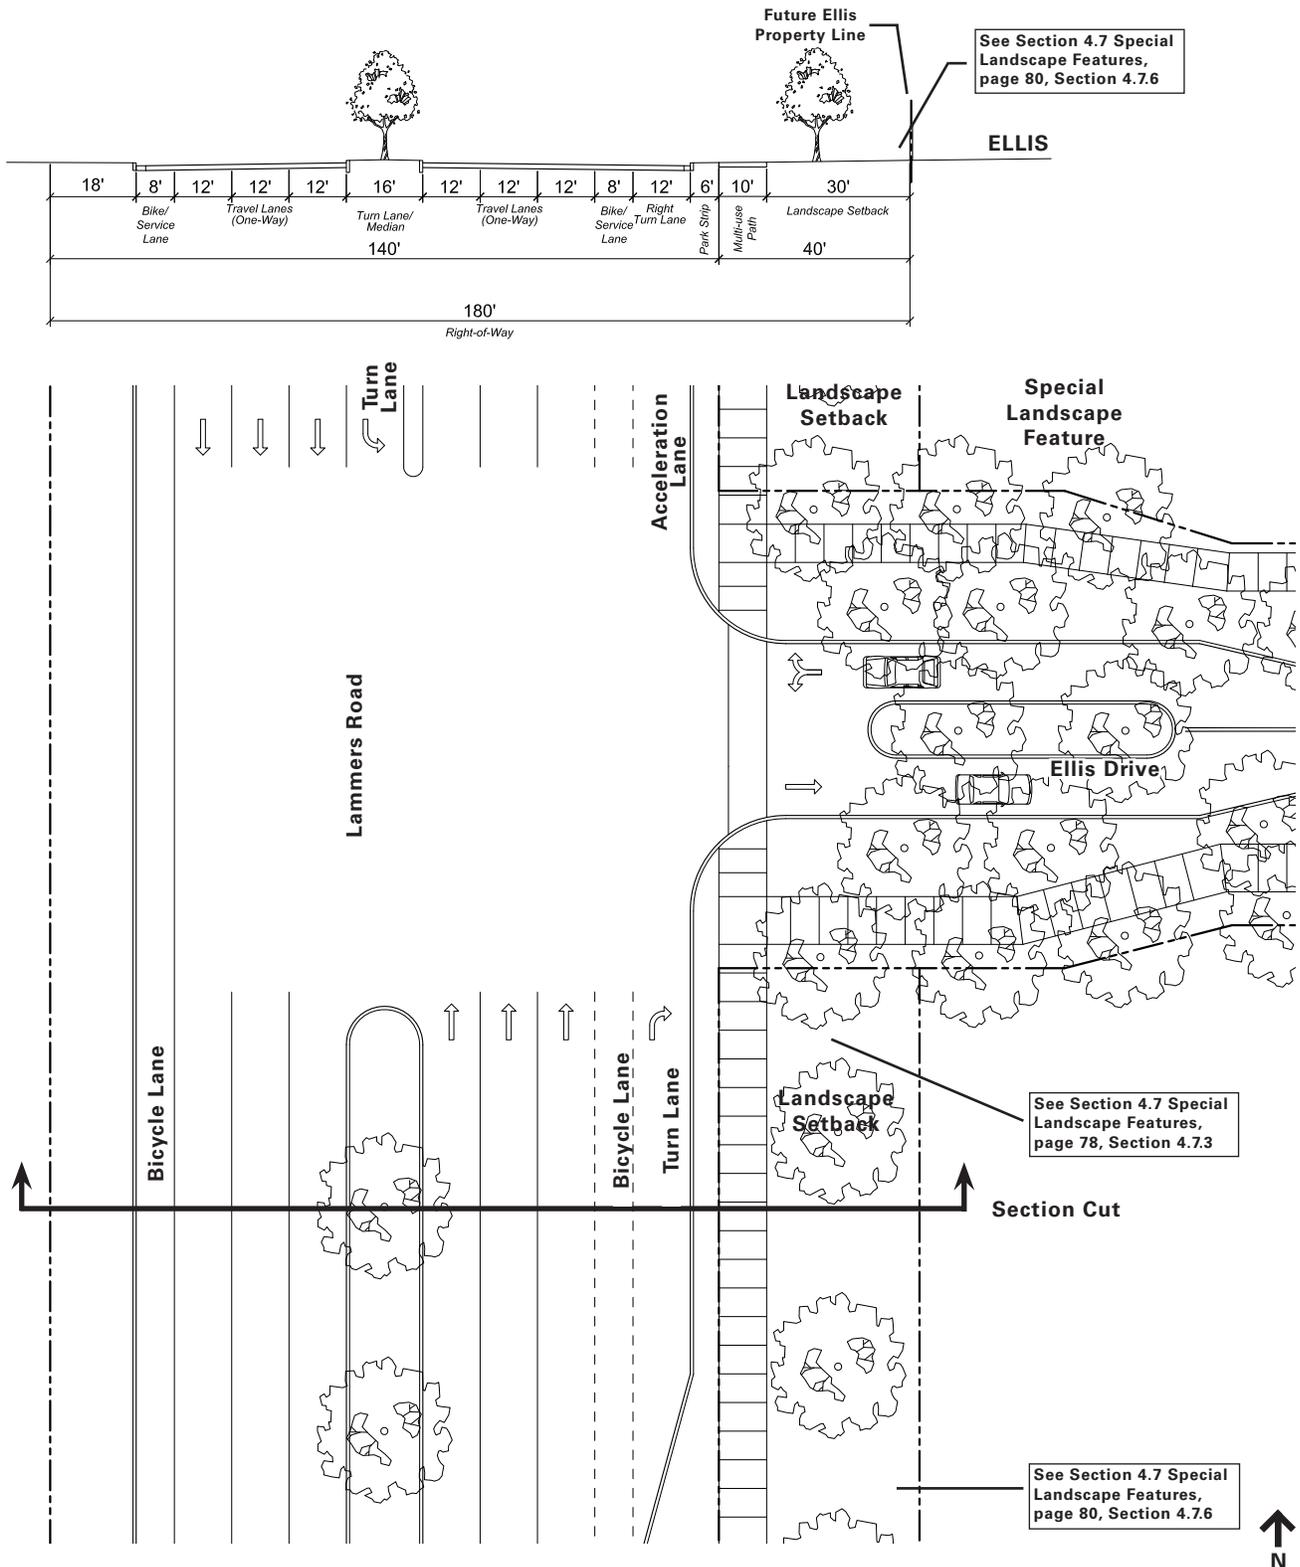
Build-out Section and Plan: Regional Arterial – Lammers Road, Designation A (Final Build-out)
